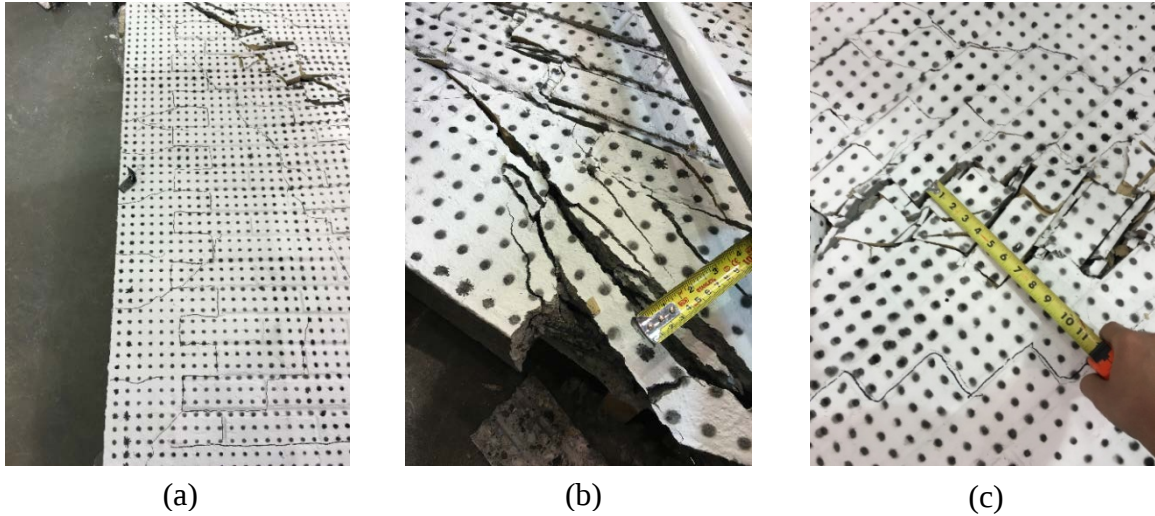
Damage observed within (a) in the shear keys located within the tie-columns of the confining concrete, (b) the concrete tie-beam at the loaded corner, (c) and the center of the masonry panel
